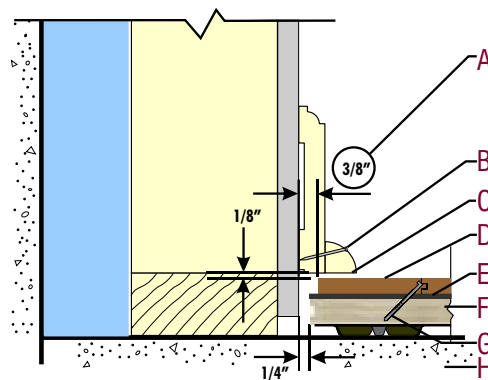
Section - Eng. Wood/Solid Wood Flooring
